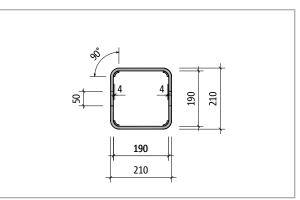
Schöck Sconnex® type P: Part T; welded stirrup and bending mould segment made of stainless steel
